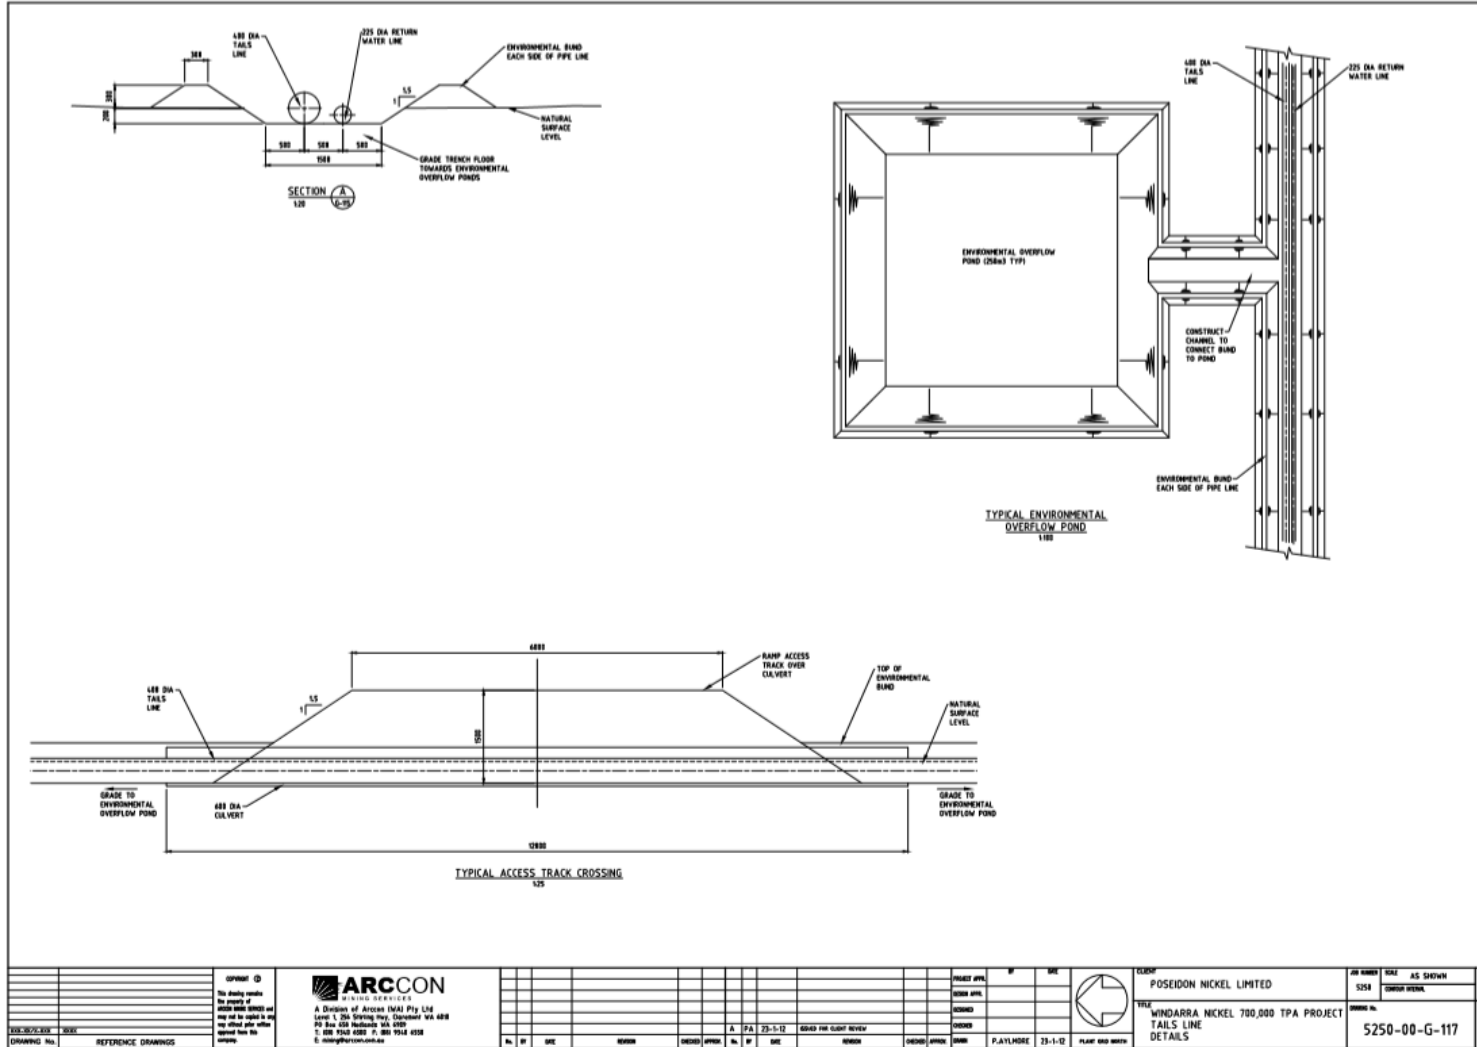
Design drawings for tailings and return water pipeline bunding, leak containment sumps (overflow ponds) and general arrangement of pipeline burial when required (Source: ARCCON (2012))
